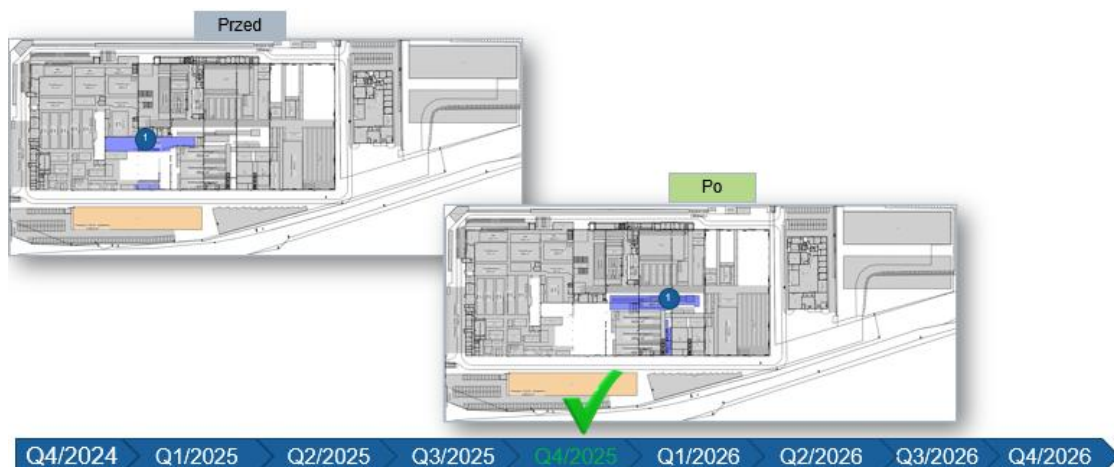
Reconstruction Plan - Stage VI: 1-Transfer of the pipe production machine (OTTOMILS).
